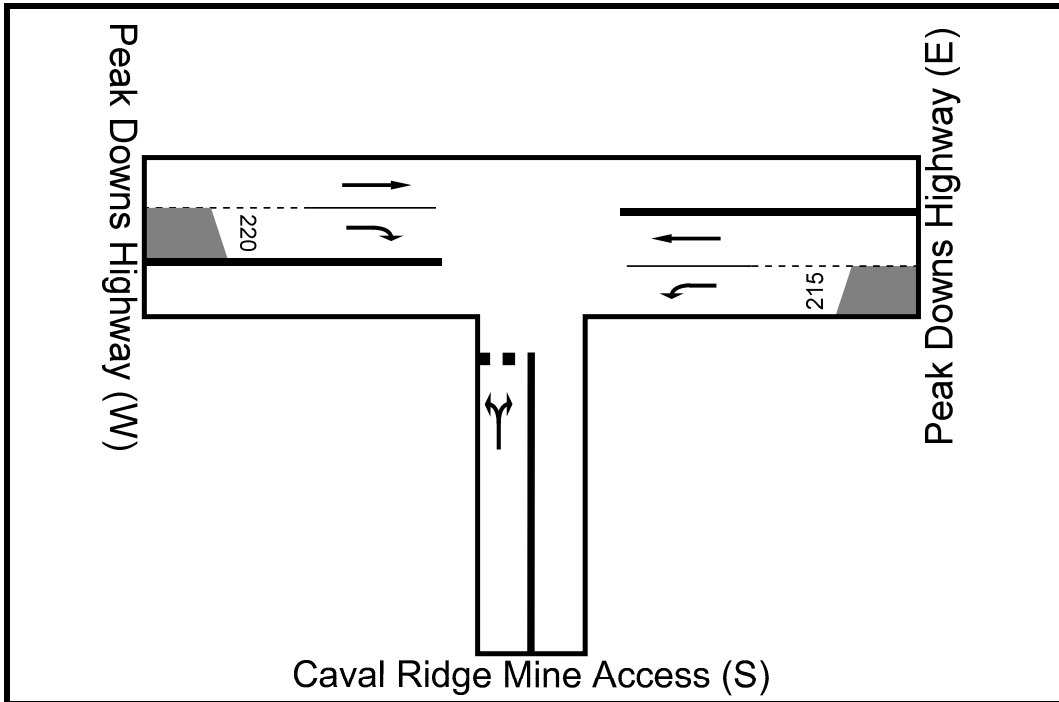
Site Access/Peak Downs Highway (Construction Phase - Intersection Layout)
